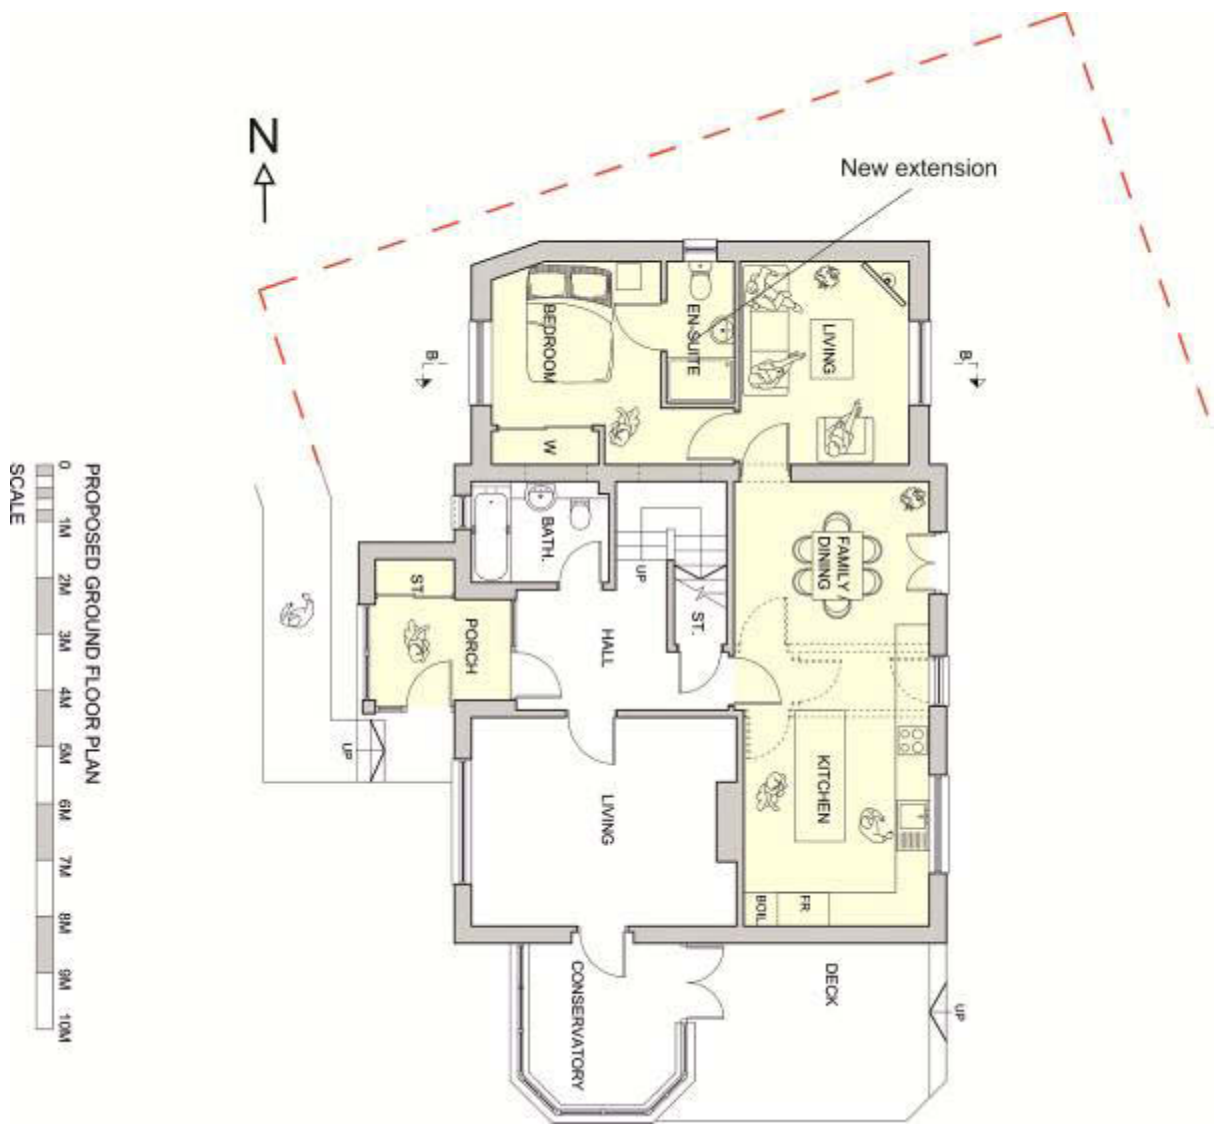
Site plan showing location of new extension (based on supplied architects plan)
